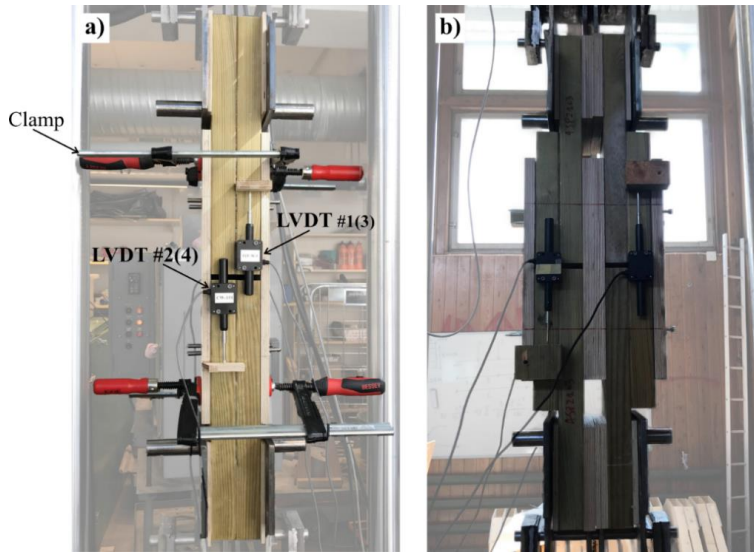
Specimens mounted on the testing machine: a) doweled specimen in double shear, and b) screwed specimen with four shear planes.
